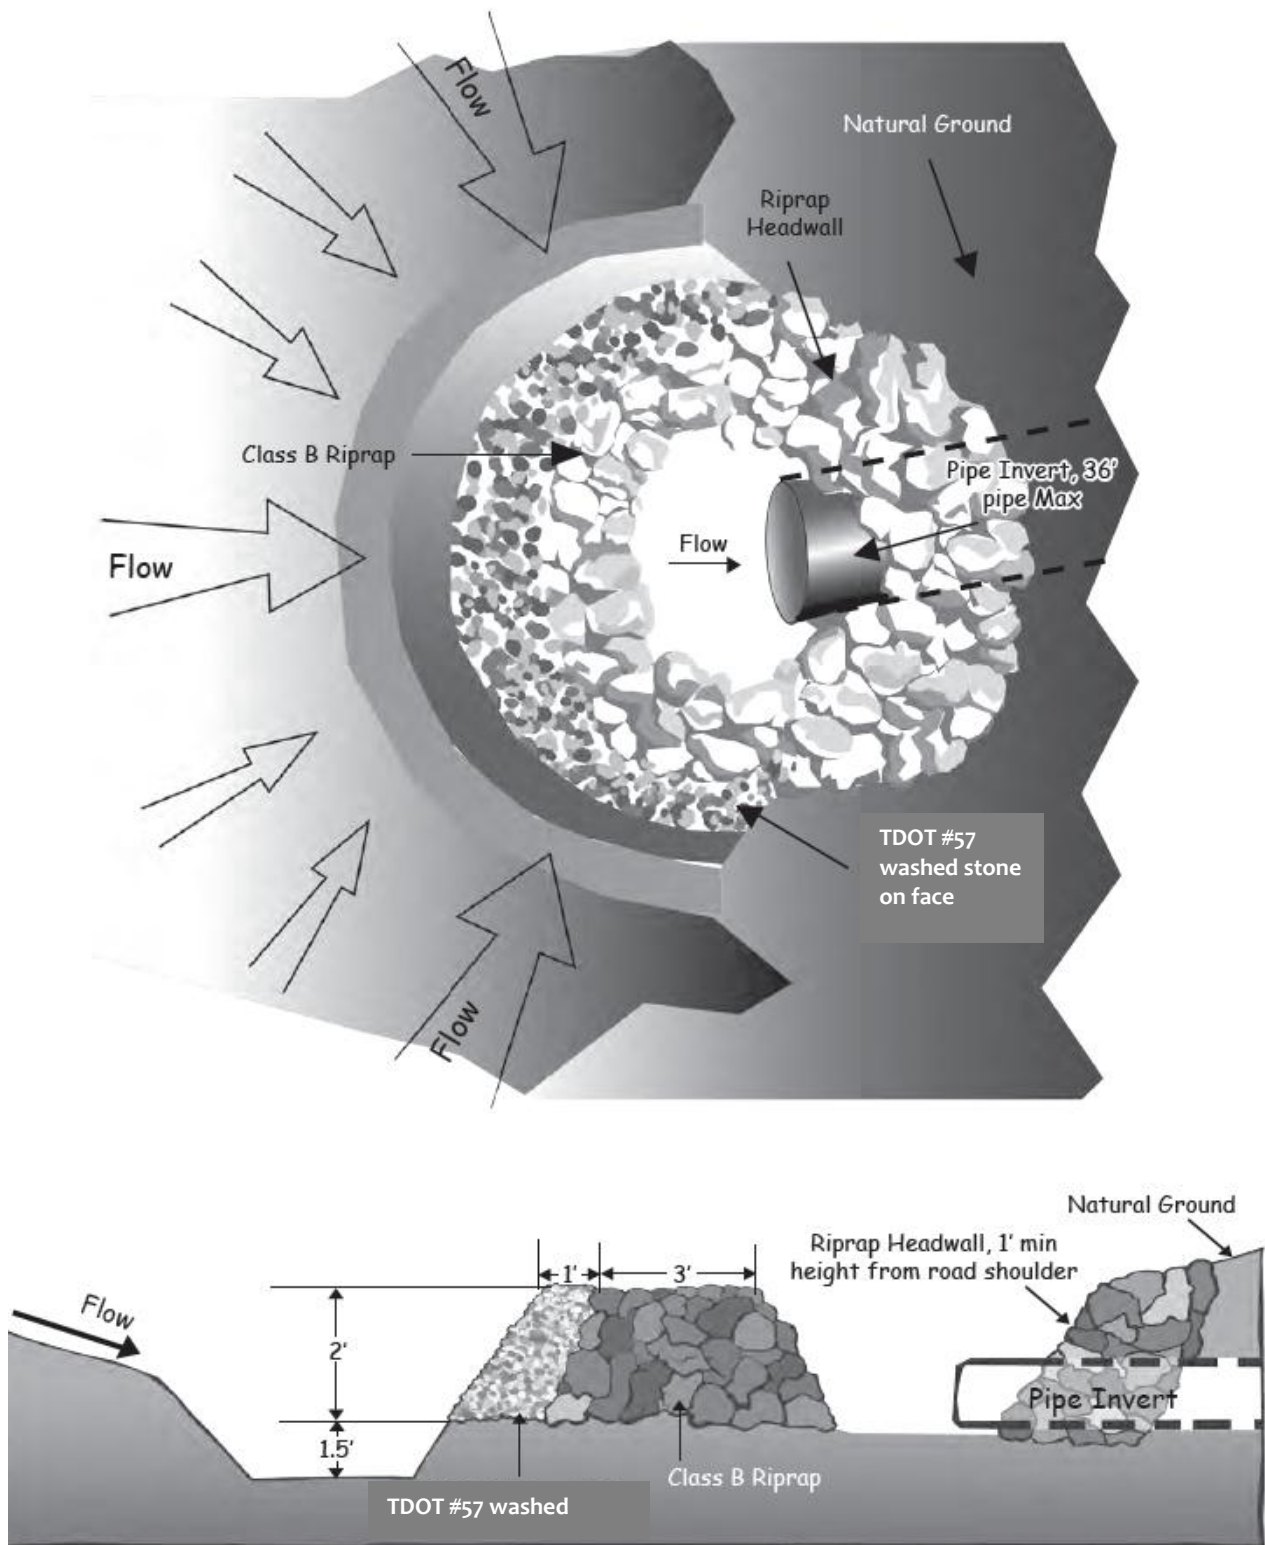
Rock Pipe Inlet Protection (Source: NCDENR)
